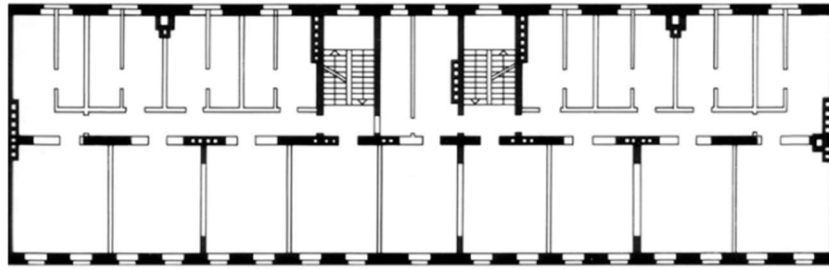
Meyers Hof: typical floor plan - load bearing walls are filled black. From Rolf Kuck's article.
